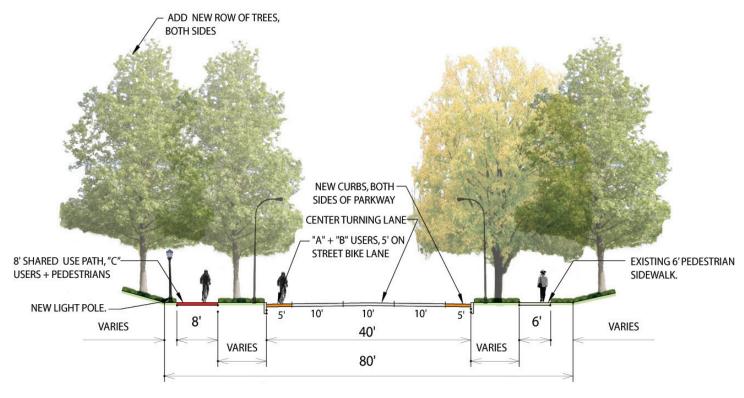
Eastern Parkway: Zone 2 Prototypical Section - Bardstown Road to Baxter Avenue
